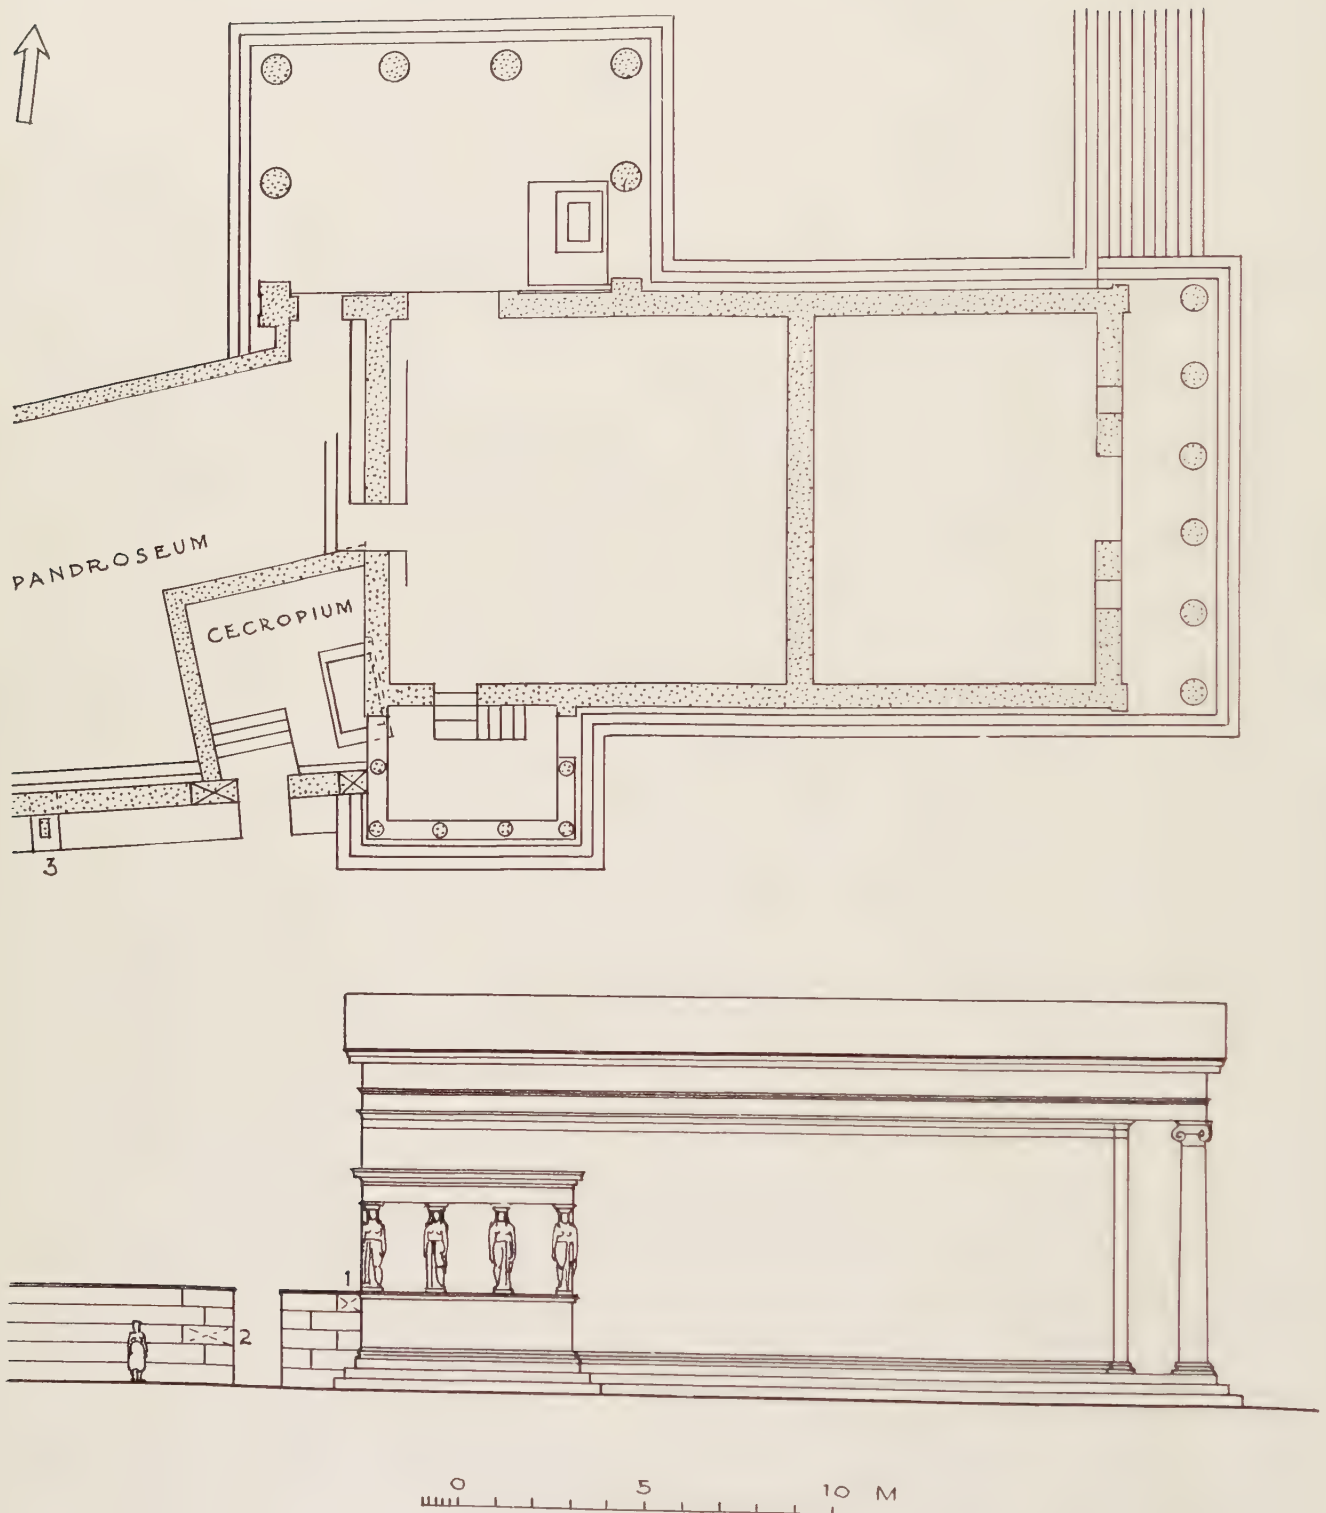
Erechtheum, Plan and South Elevation: Restoration
